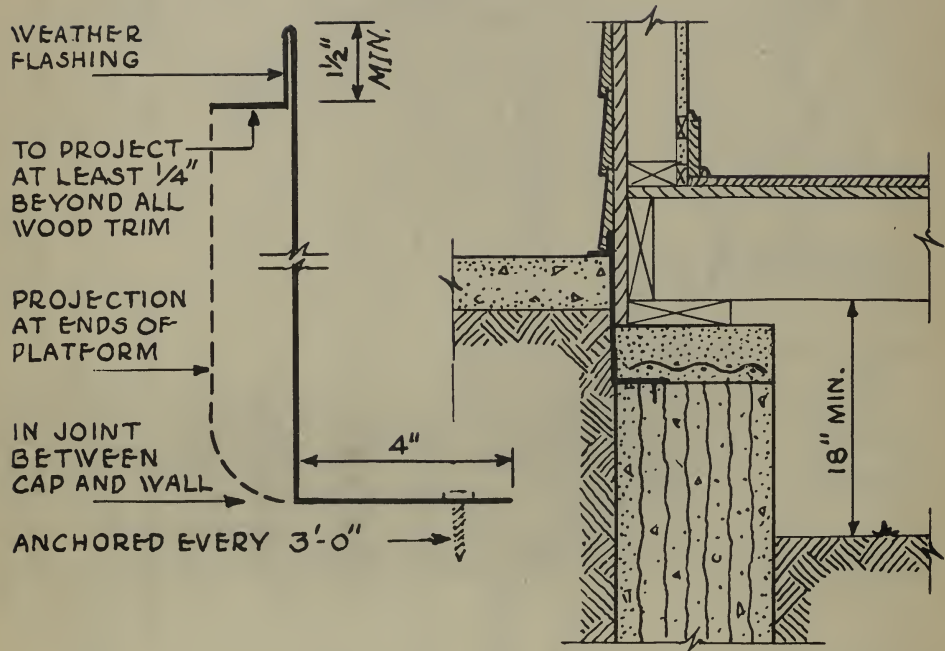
METAL APRON inserted between concrete slab and woodwork, anchored to unit type foundation and capped with reinforced concrete. The apron serves as a weather flashing as well as a termite barrier.
